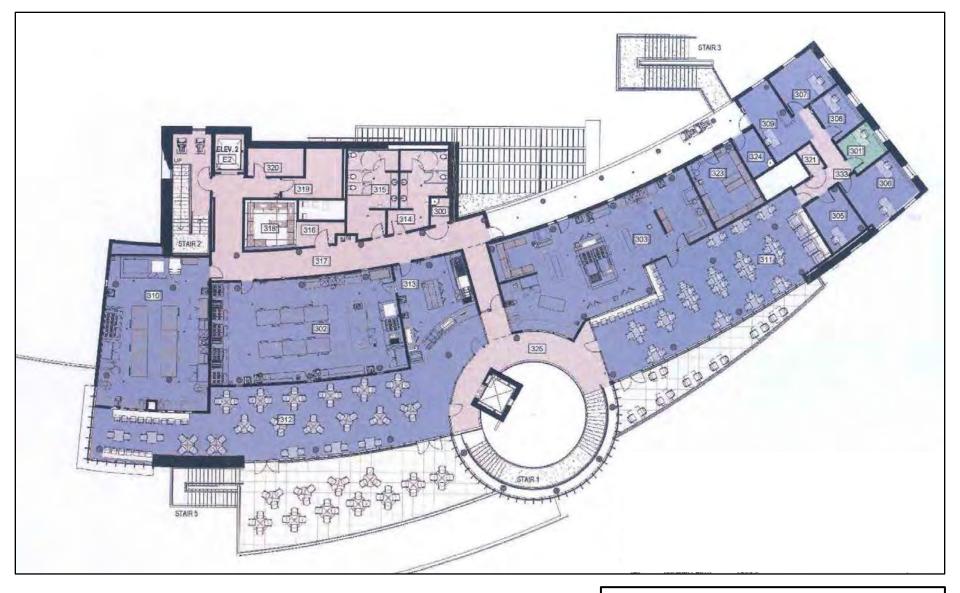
Third Floor Plan for New Campus Center Building PWP-4-CSB-15-0001-2 & CSB-NOID-0003-15
